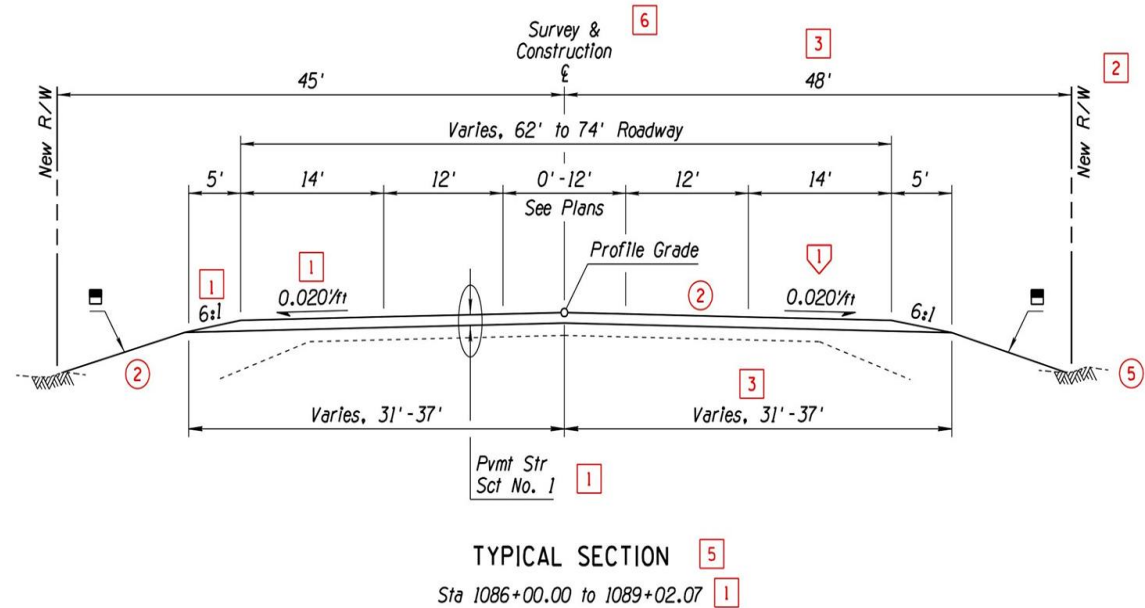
Example of an ADOT Typical Roadway Cross Section[4]
